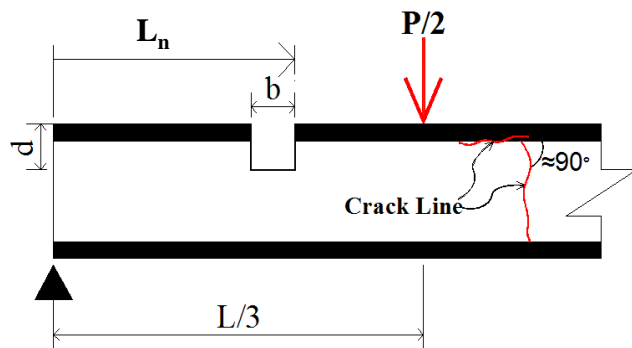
Failure mechanisms exhibited in tested I-joists with flange notch (Series: 12-F, 12-G, 12-H, 12-I, 20-K, 20-L, 20-M, and 20-N)
